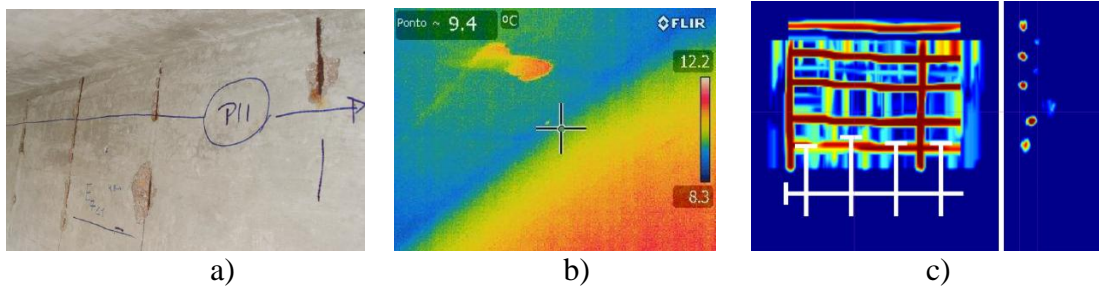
Inspection techniques: a) photography record of corrosion and delamination; b) infrared thermography image; c) GPR image obtained with a steel rebar detector.
